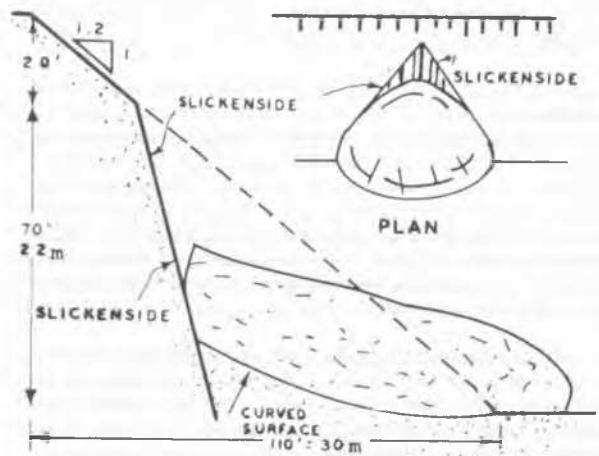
Cross section and plan of a slide on a curved surface below two intersecting slickensided planes in weathered tuff in a road cut in Puerto Rico
